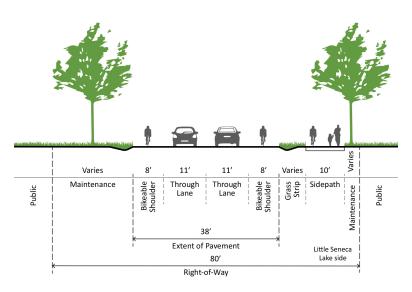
Proposed Typical Street Section for Clarksburg Road
